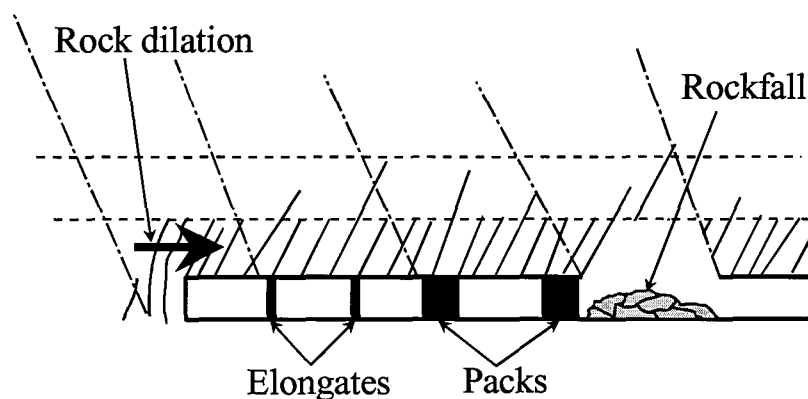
Stope with a back area rockfall lading to reduced hangingwall confinement.
